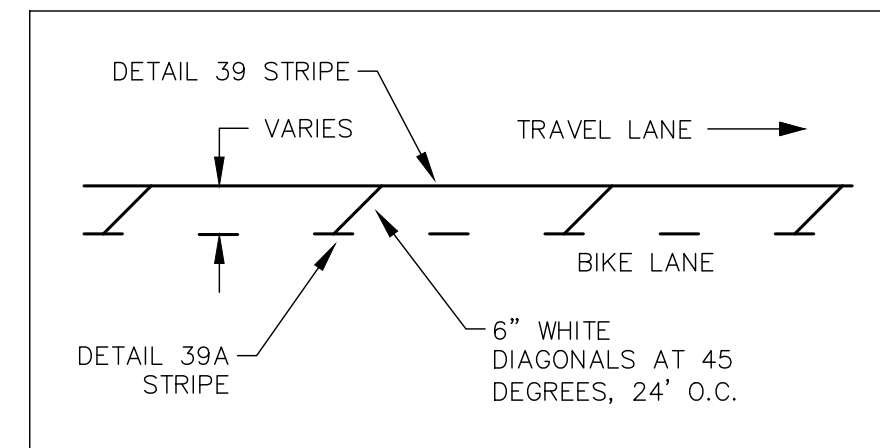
BIKE LANE STRIPING AT CONFLICT POINTS
